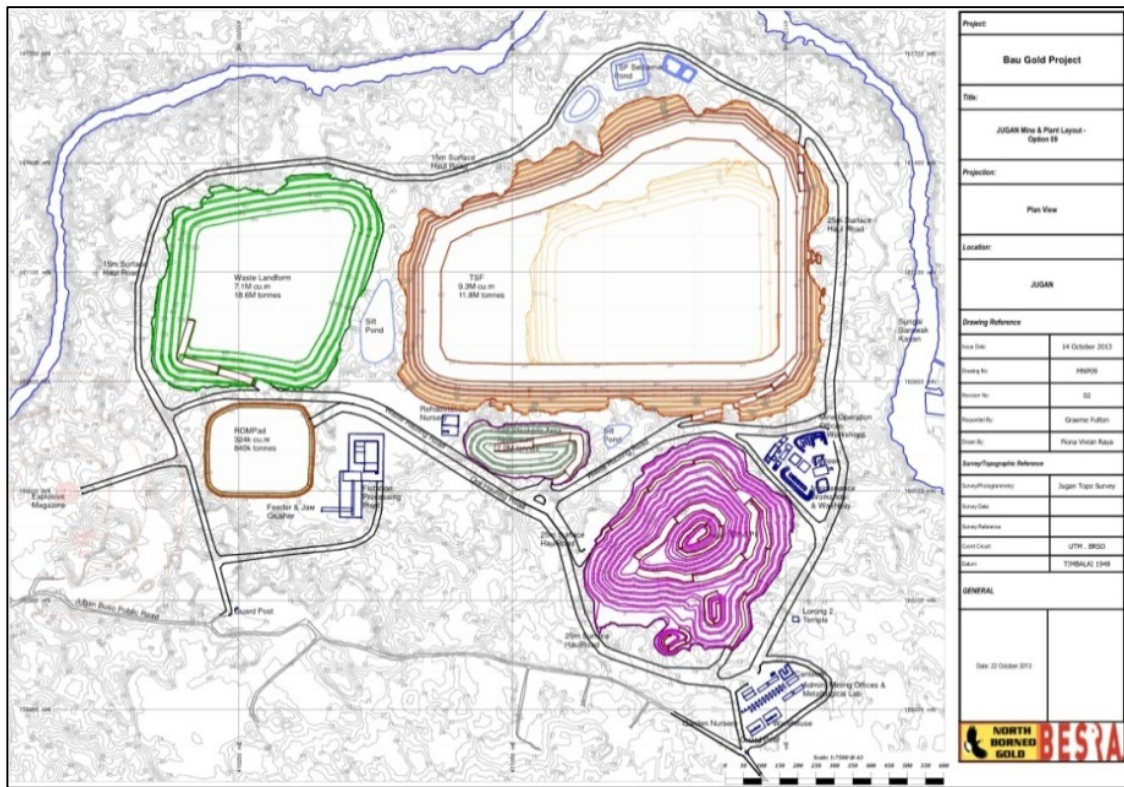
Jugan – Alternate Infrastructure Layout Plan
